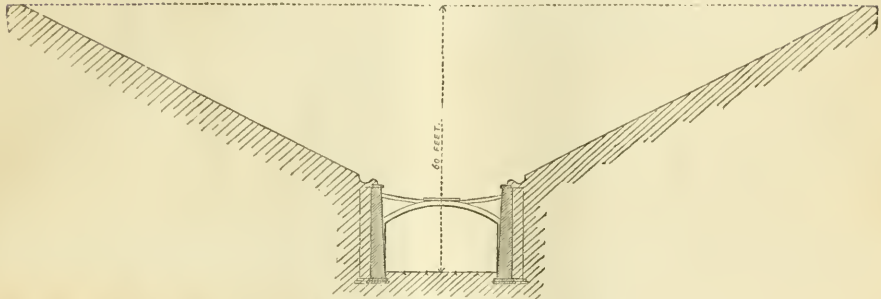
Transverse section of the Chorley Cutting, with stone Struts.
